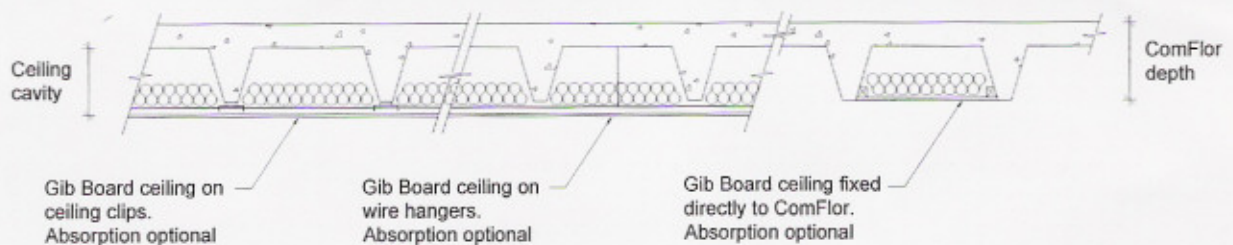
Typical Section through ComFlor 210 Showing Ceiling Options
